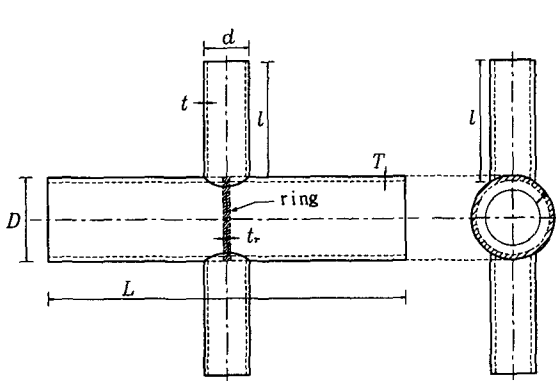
Dimensions of internally ring stiffened tubular X-joint.
